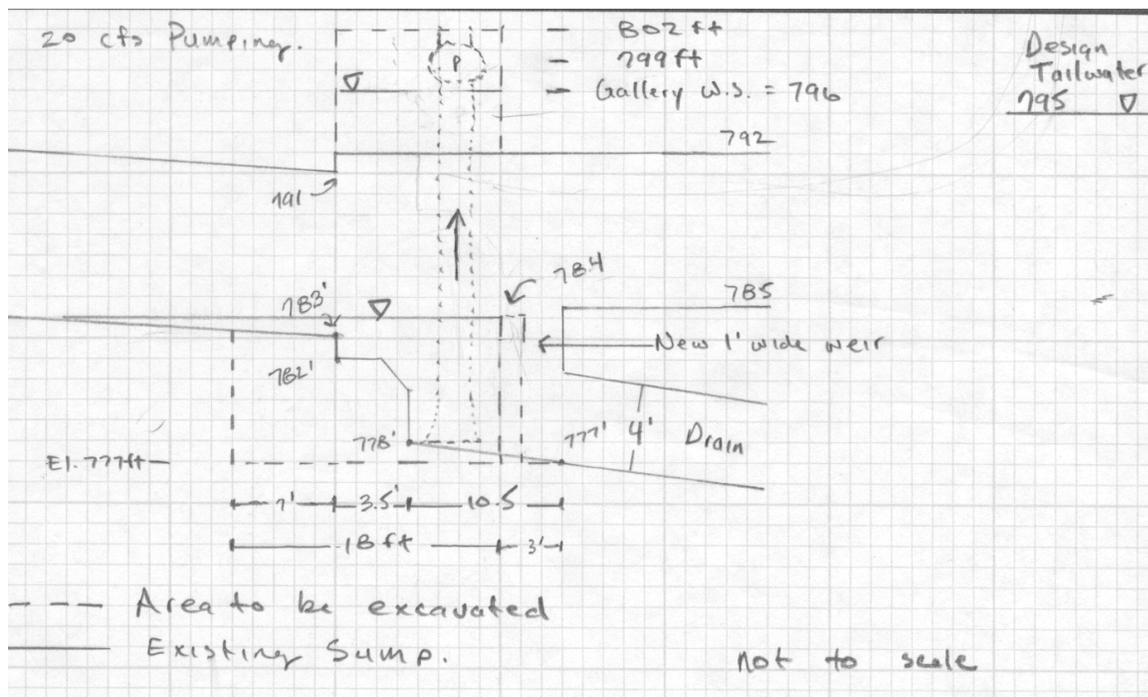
Proposed Conceptual Sump Chamber Cross Section
